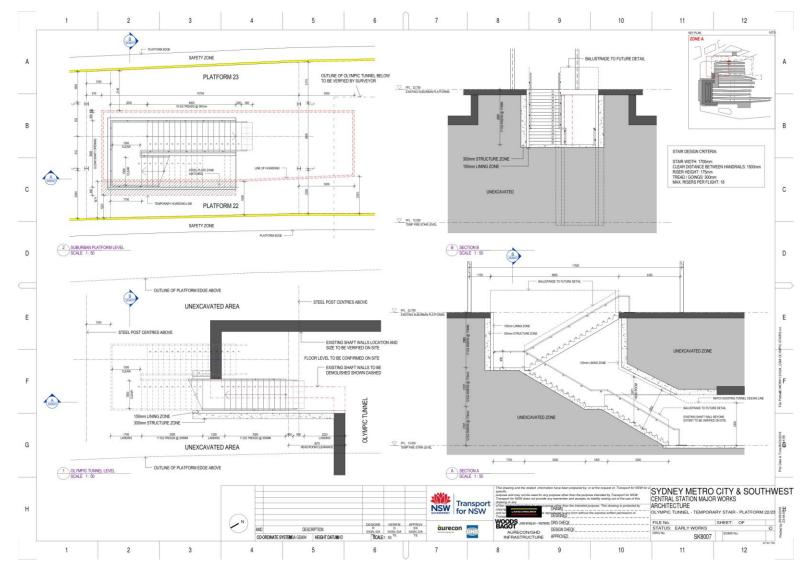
Proposed hoarding and initial 2m deep excavation for the future temporary staircase on Platform 22/23 (Source: Laing O'Rourke, 2018).
